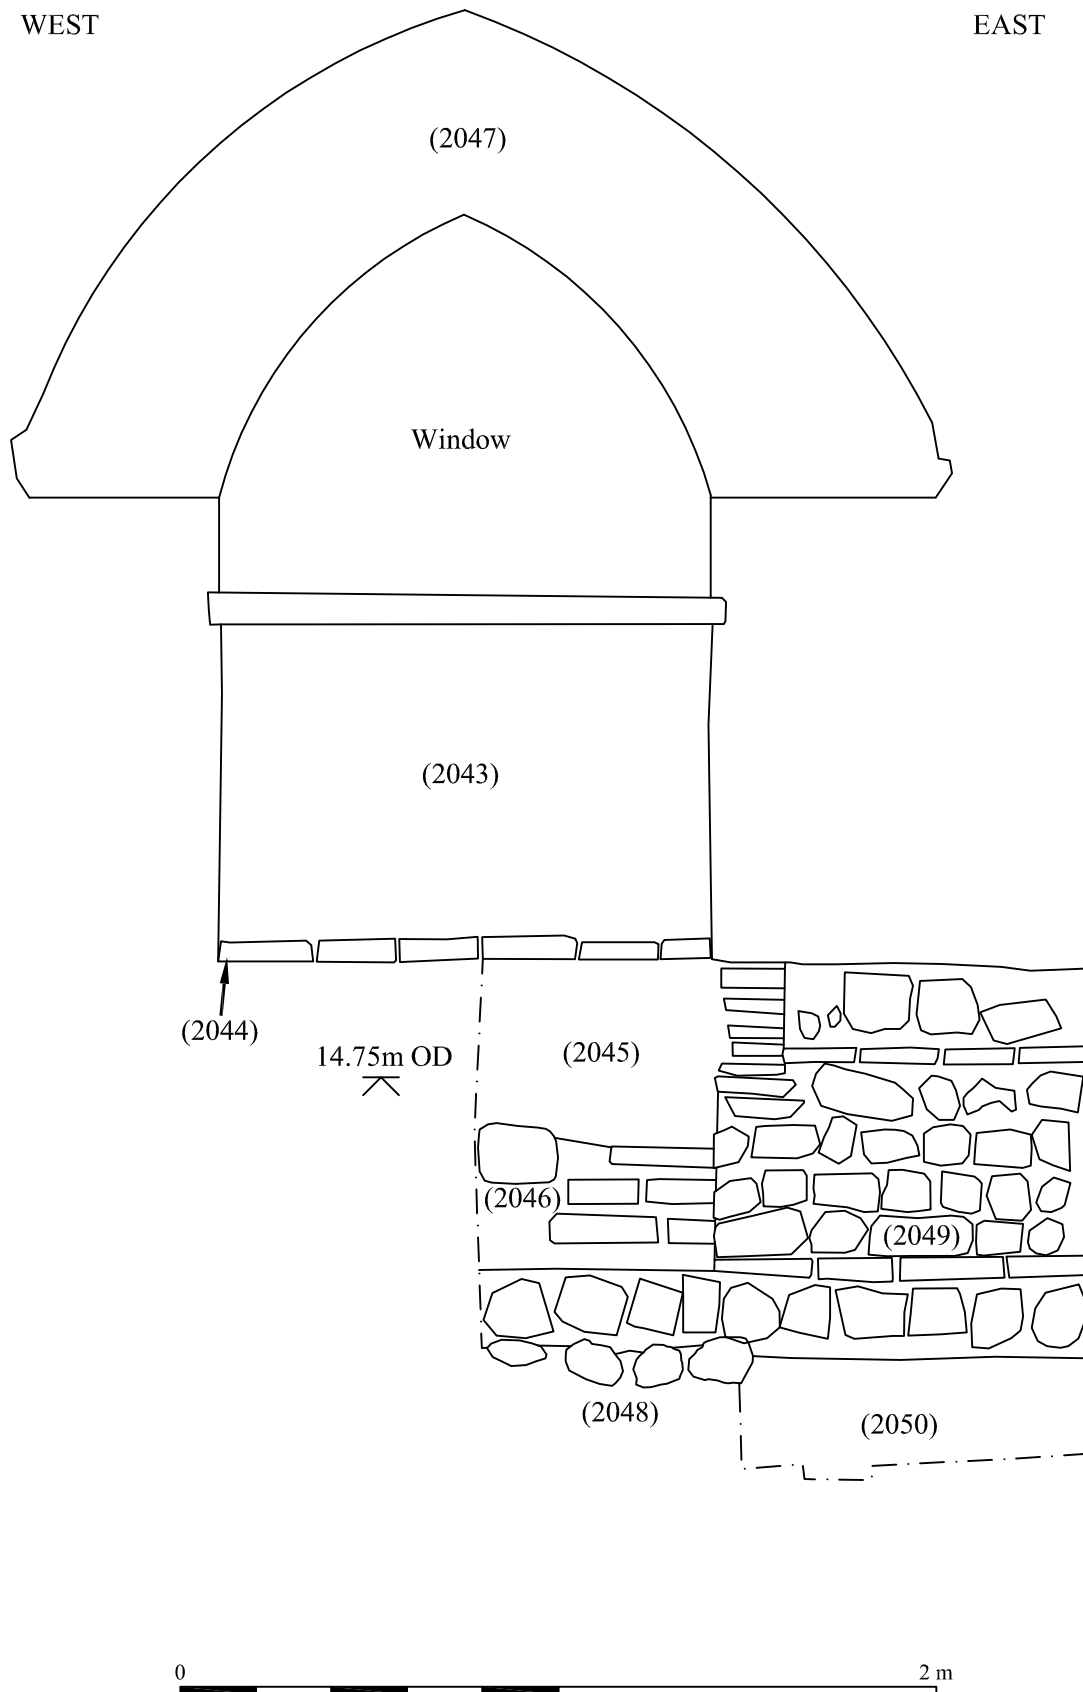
South facing elevation of Trench 1 showing blocked south doorway. Scale 1:20.
